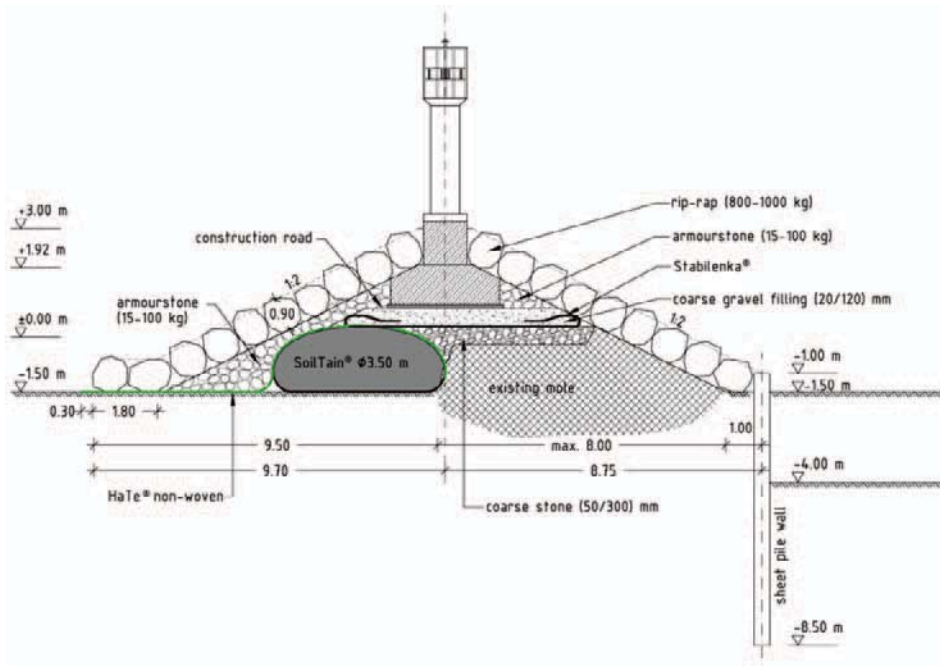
Cross-section of the reconstruction incorporating geosynthetic tubes at Port Kuivizu, Latvia, 2007/2008
